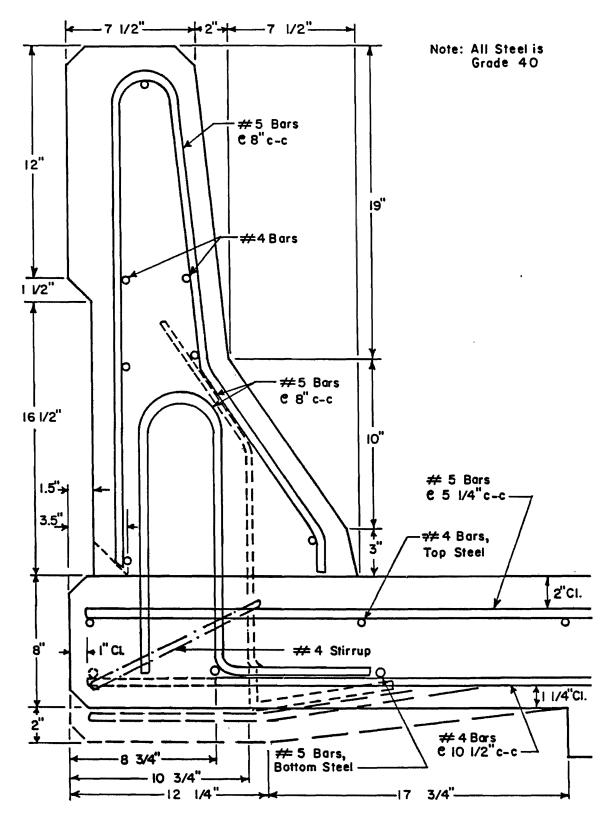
Composite Drawing of Modifications to the Texas Type T5 Concrete Bridge Rail and Deck.
